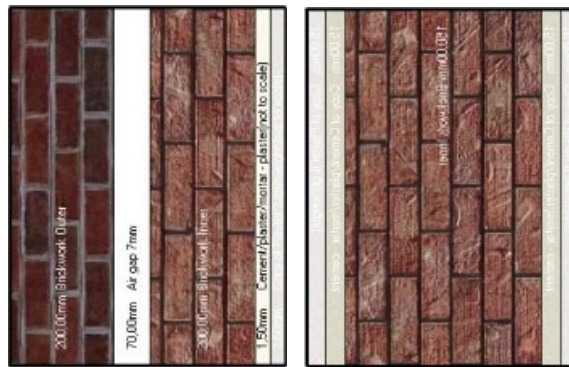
Exterior wall and interior wall layers of non-insulated building
